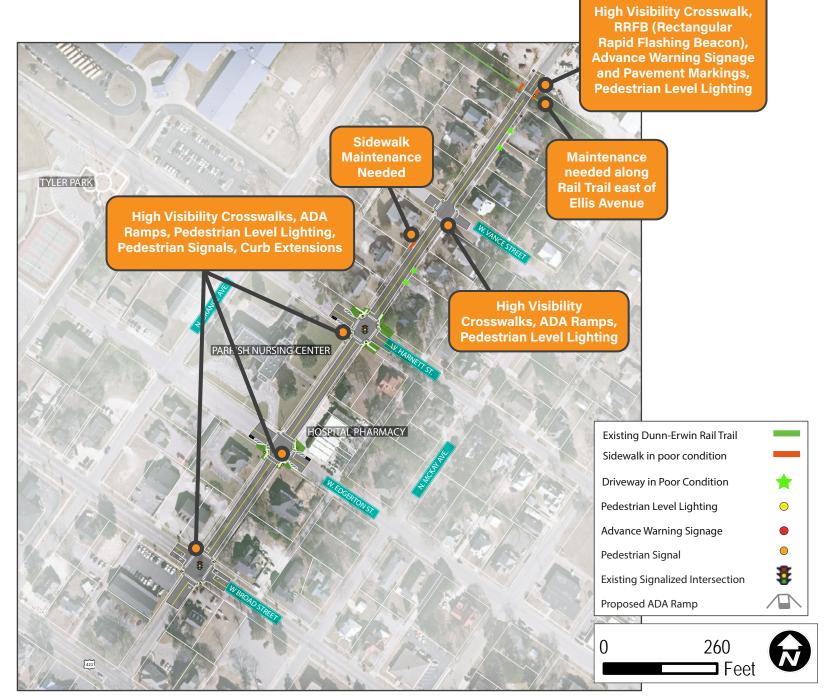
Conceptual design of Ellis Avenue from Rail Trail to Broad Street.
